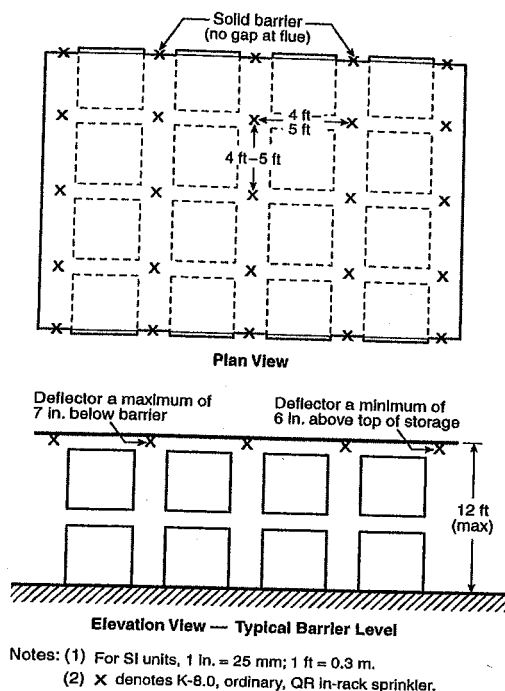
(c) Multiple-Row Rack Sprinkler Layout for Design Scheme "A." [30: Figure 16.6.1.1(c)]
